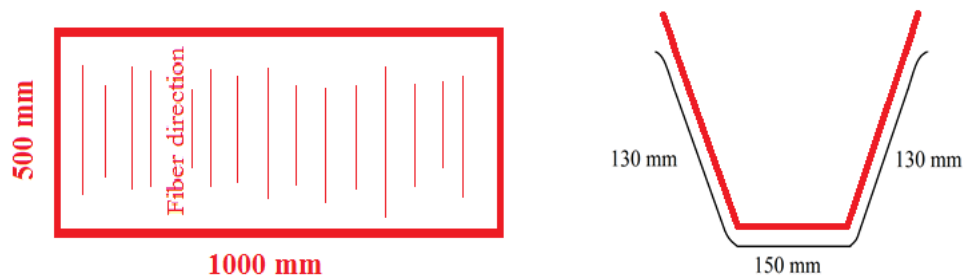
U-shape steel mold for fabrication of stirrups
